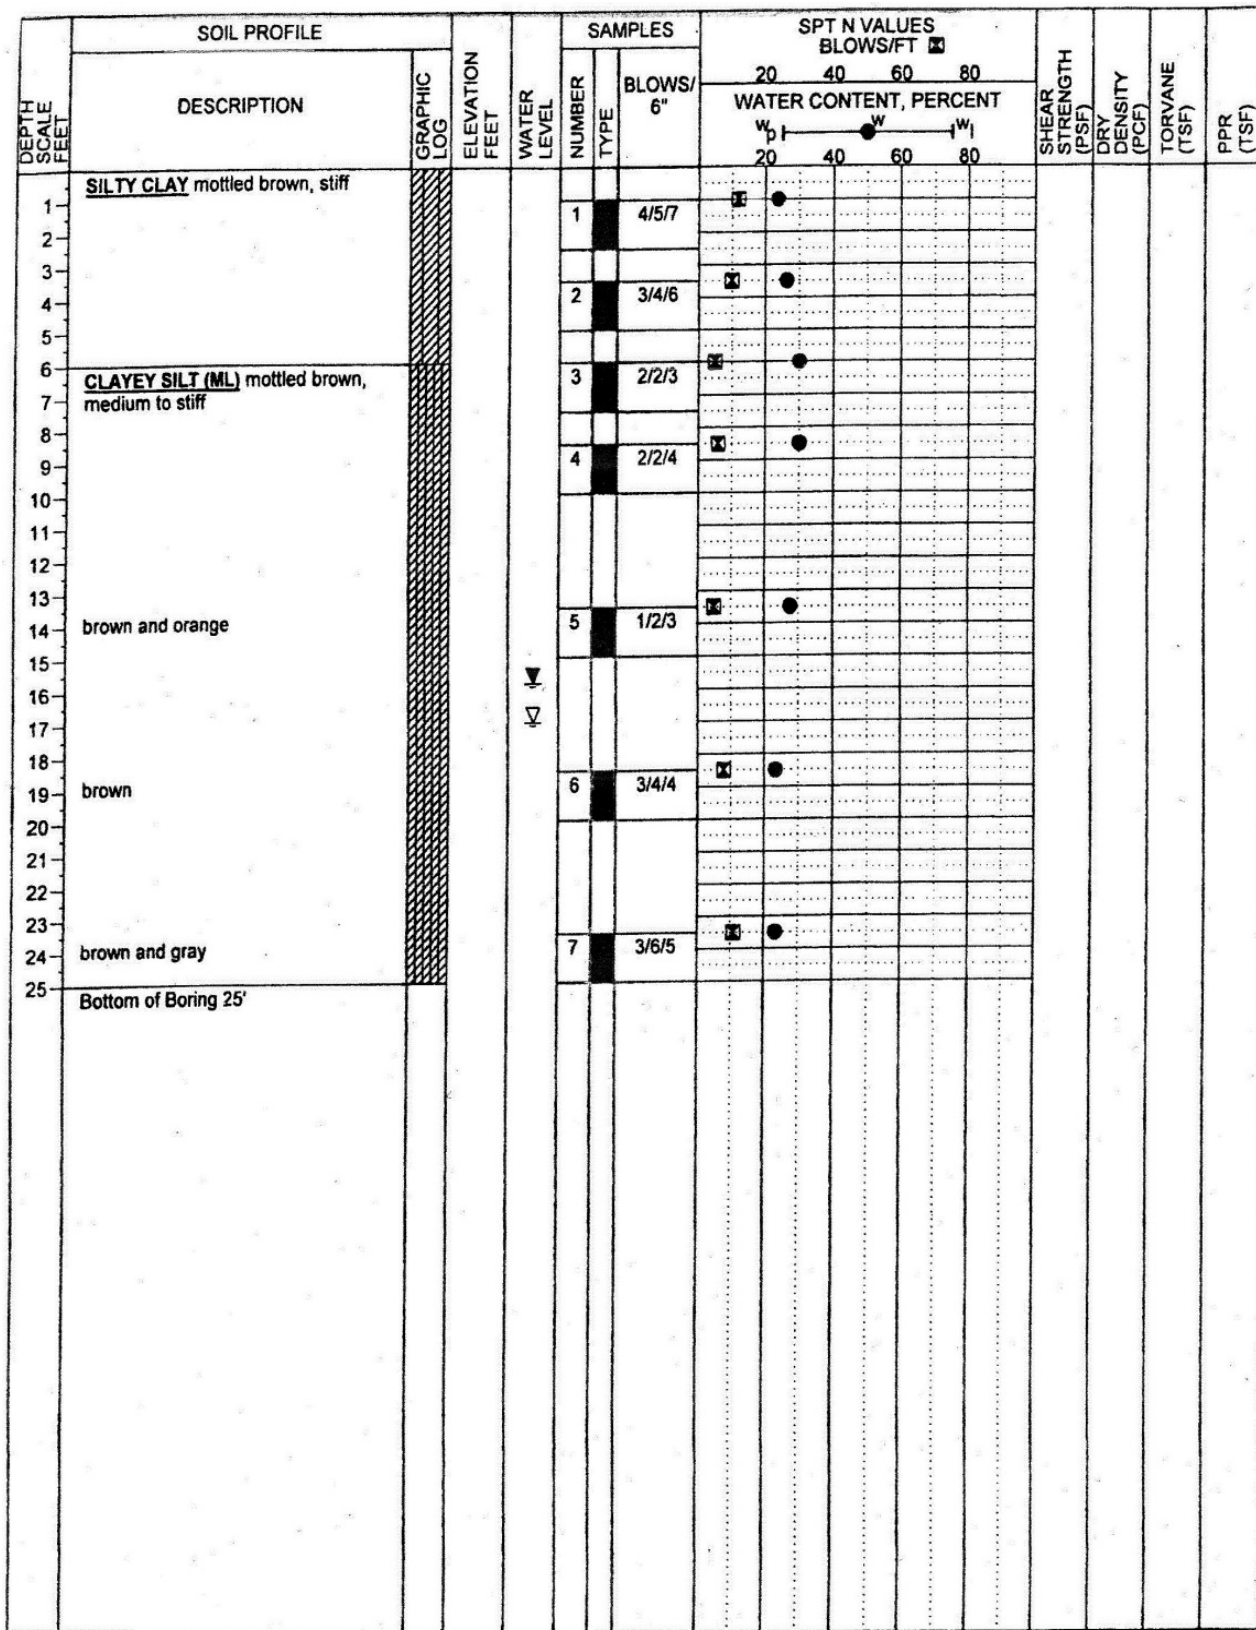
Soil profile at the site of the apartment building (courtesy of Geotechnology, Inc).
